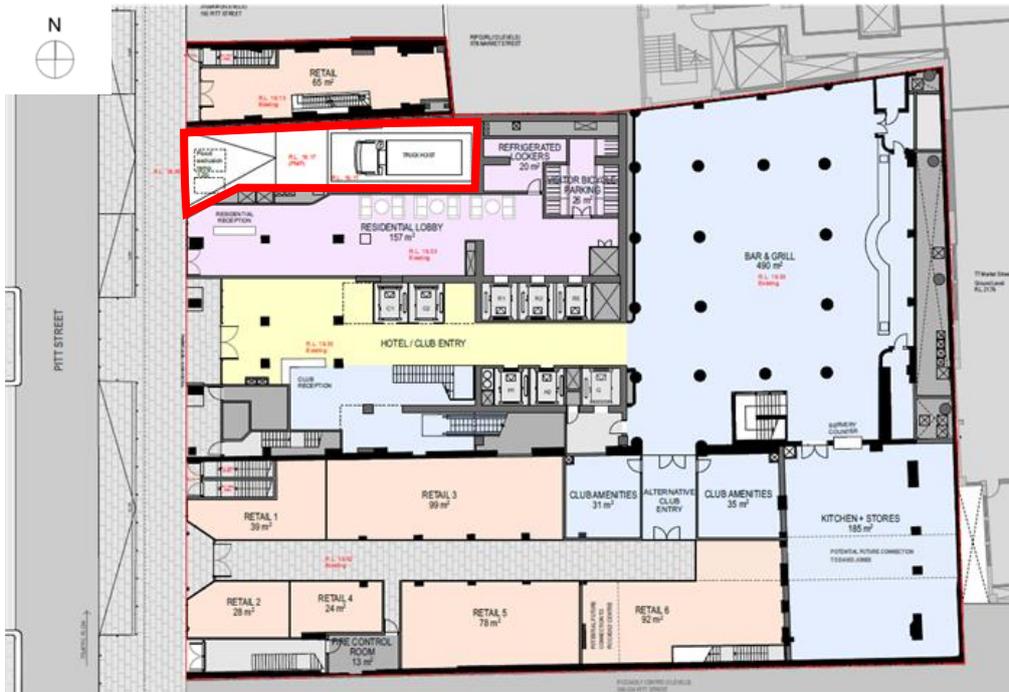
Indicative ground floor plan extract, with the driveway and hoist highlighted in red.
